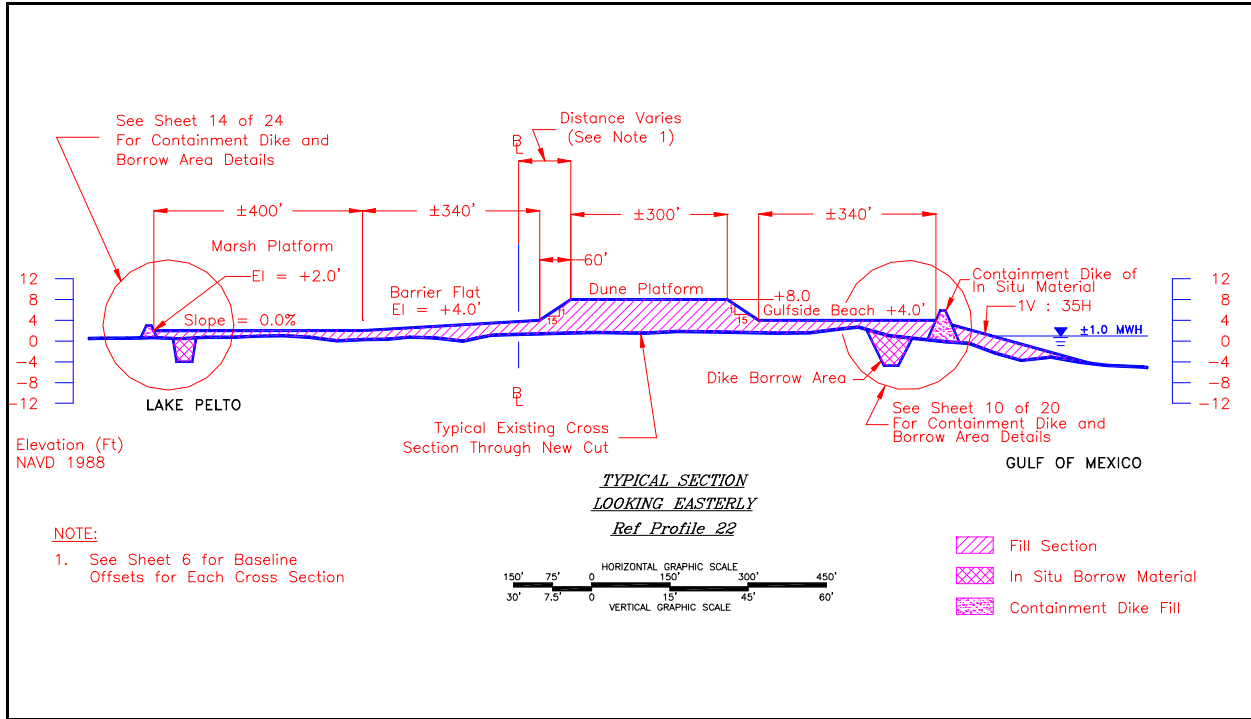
Typical design cross-section of the New Cut Dune/Marsh Restoration (TE-37) project.
